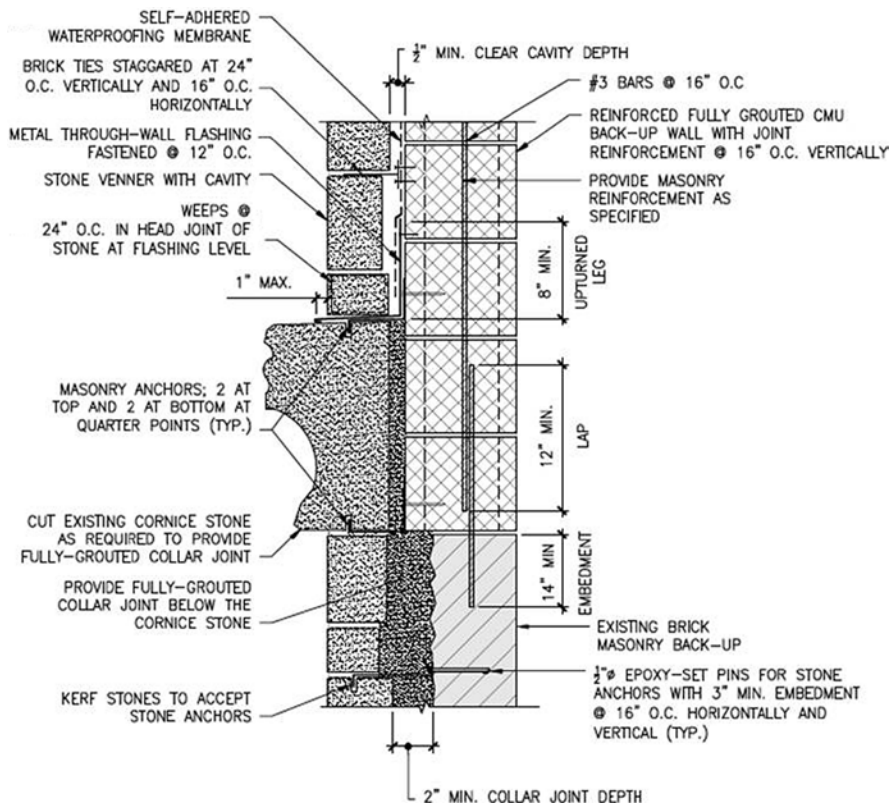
Cross section of rehabilitated tower wall (Note: 1 in. = 25.4 mm)
